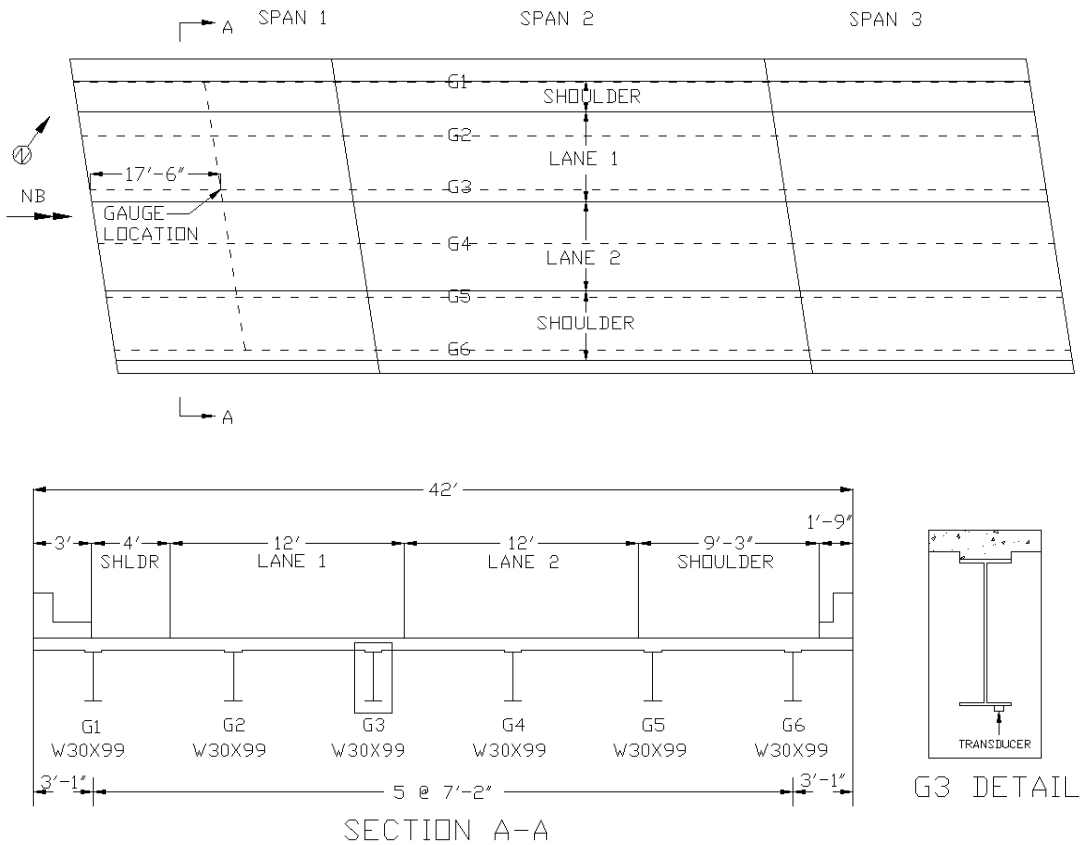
Bridge 1-821 N plan, Span 3 cross-section and Girder 3 detail
